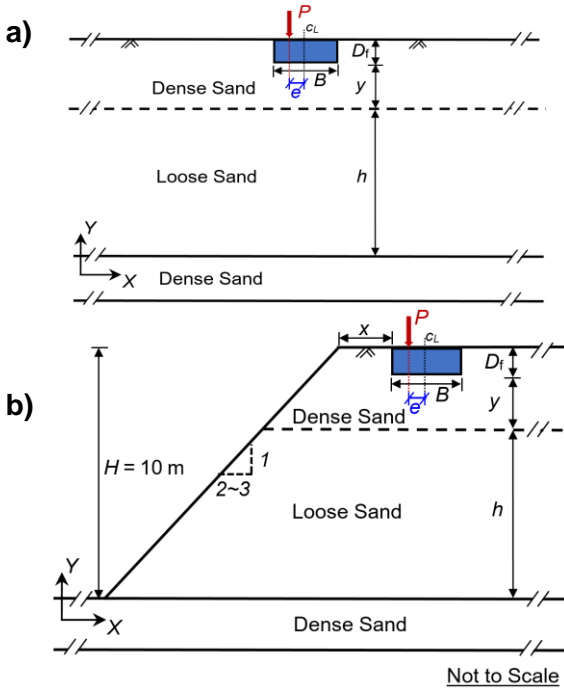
Geometry of the problem: a) footing on level ground, and b) footing near slope
